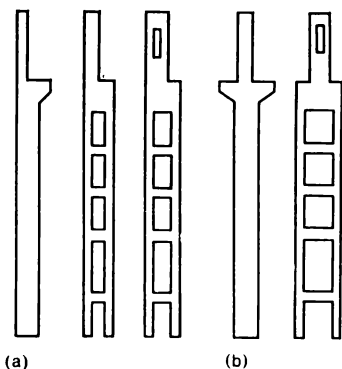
Reinforced concrete columns for single-storey industrial buildings
